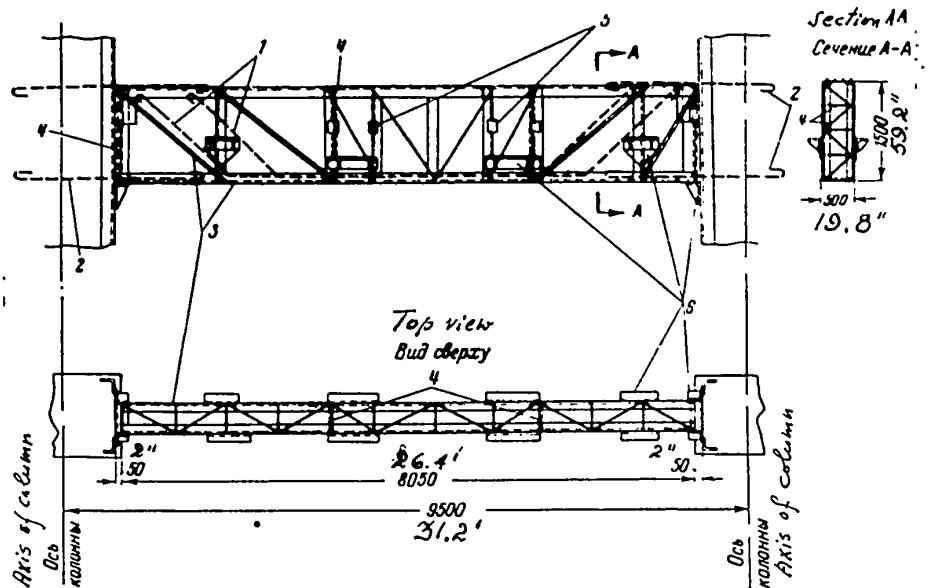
Rigid Welded Steel Reinforcement of a Cross Girder.
